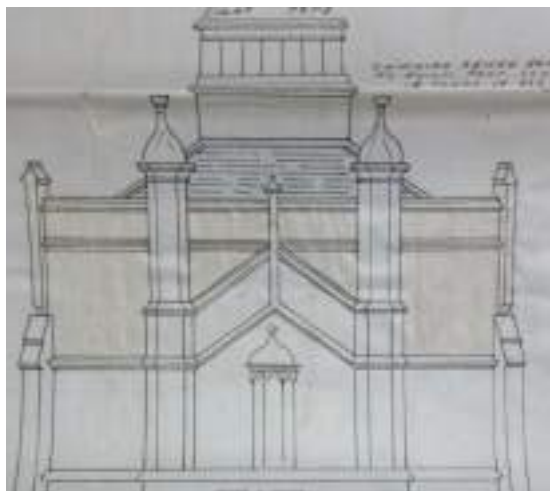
(left): Proposed end elevation of both north and south wings at second and third floor level, 1903.
